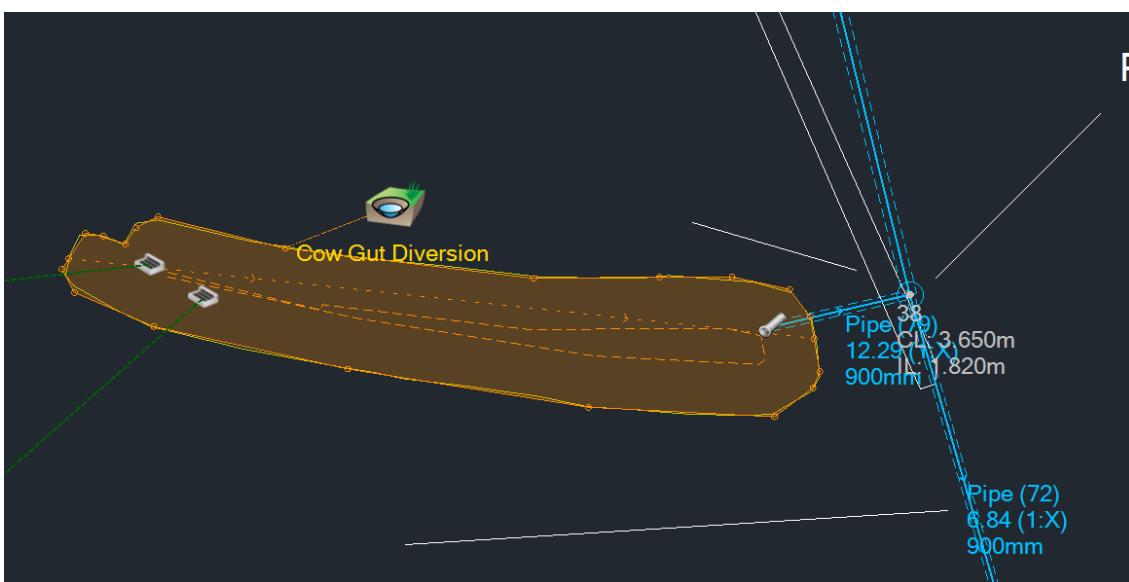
Plan of cow gut diversion connection to downstream pipework
